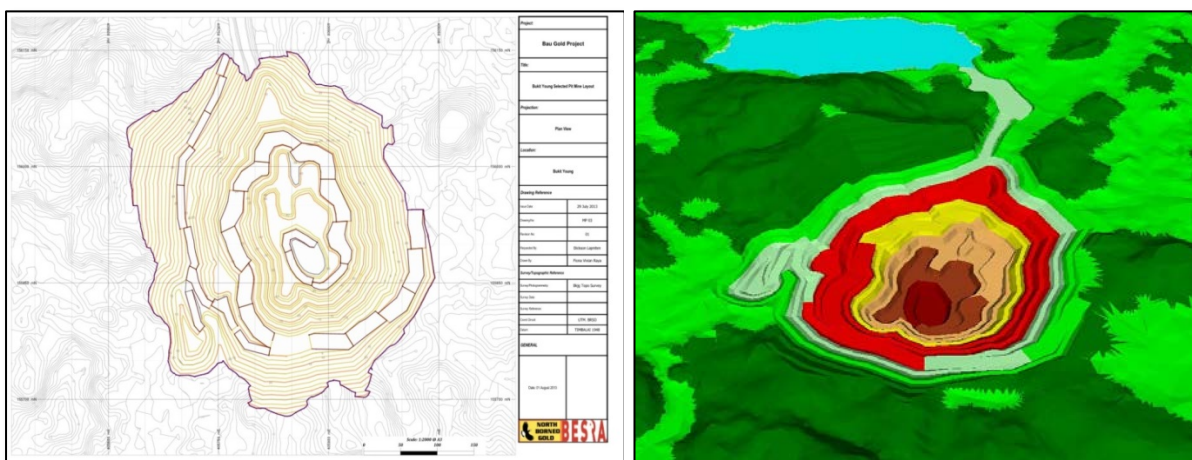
BYG-Krian Detailed Pit Design - Plan & 3D View
